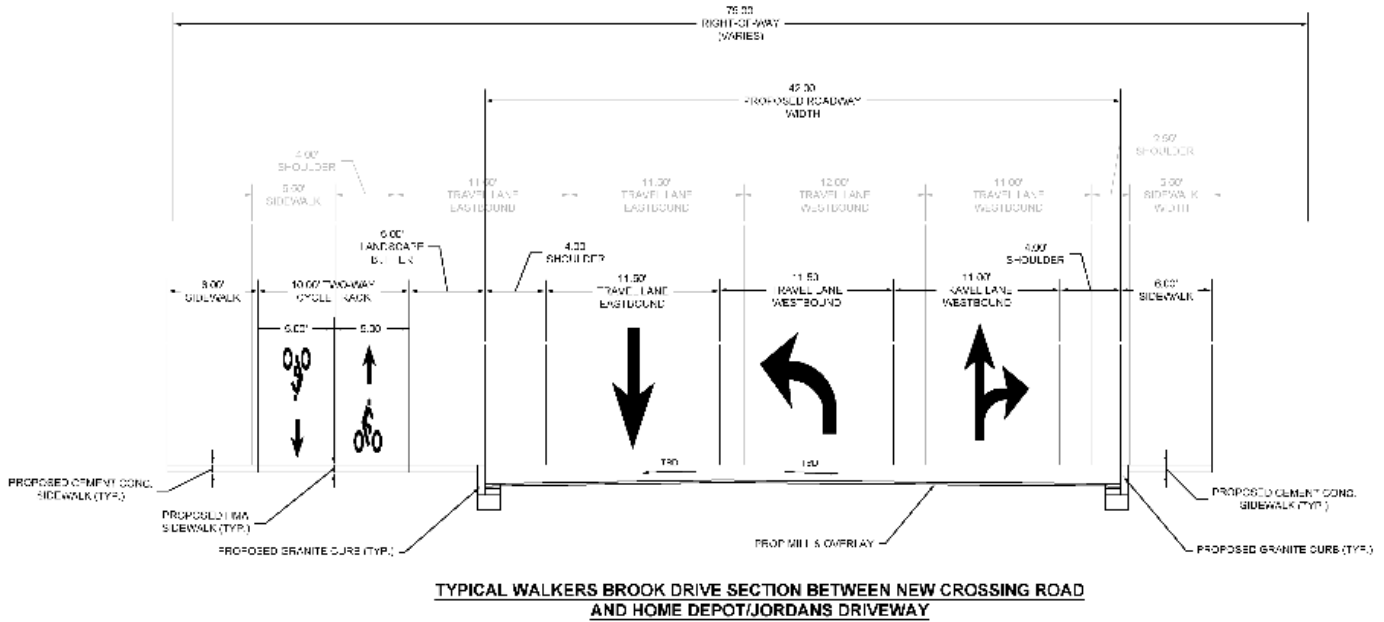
Alternative 3 (off-road two-way cycle track) – Typical Section 1
